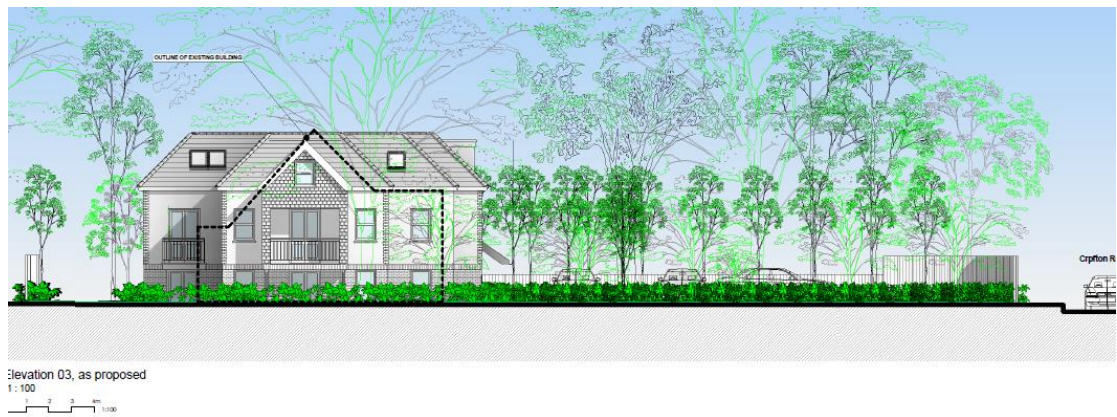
Elevation plans of the allowed scheme at 132 Crofton Road/Middlewood Court and dotted lines in block colour represent the former houses
